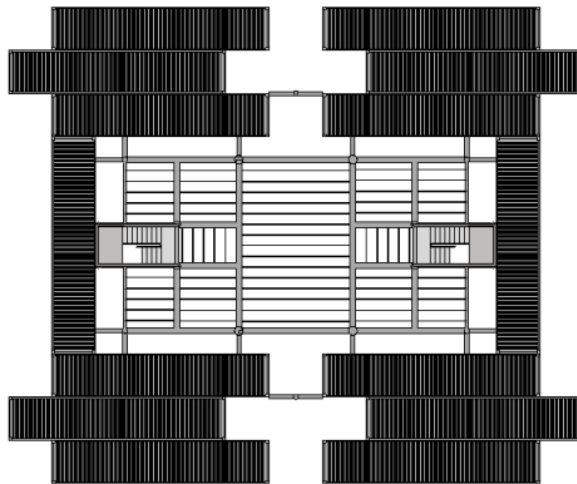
Wood Framing on Structural Concrete as a Roof Support.
